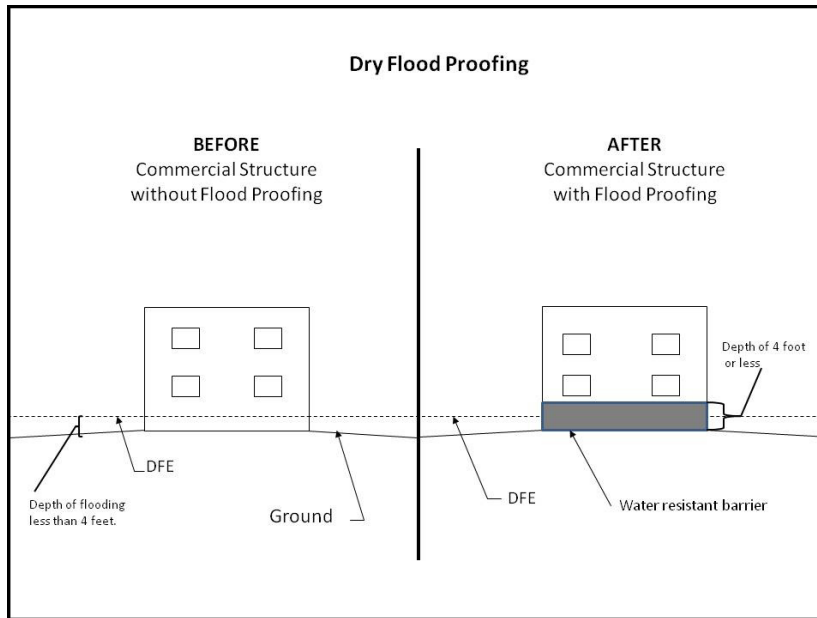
Structure Dry Floodproofing Conceptual Illustration
